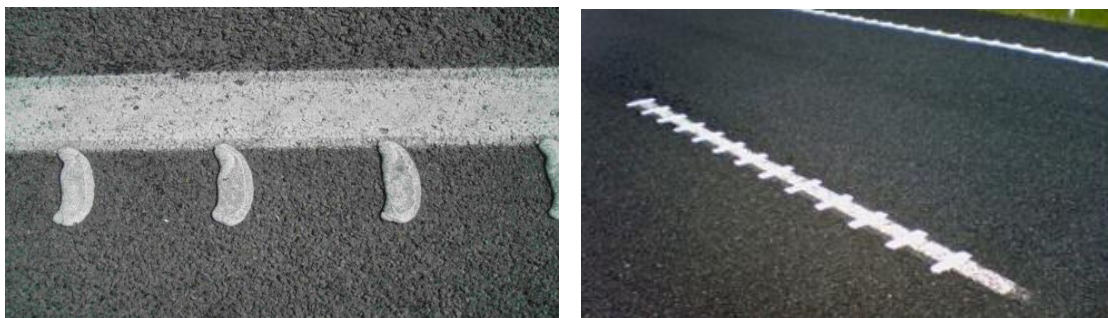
Audio tactile pavement marking (ATPM) used in New Zealand (left image: Lester et al, 2017, page 10)
